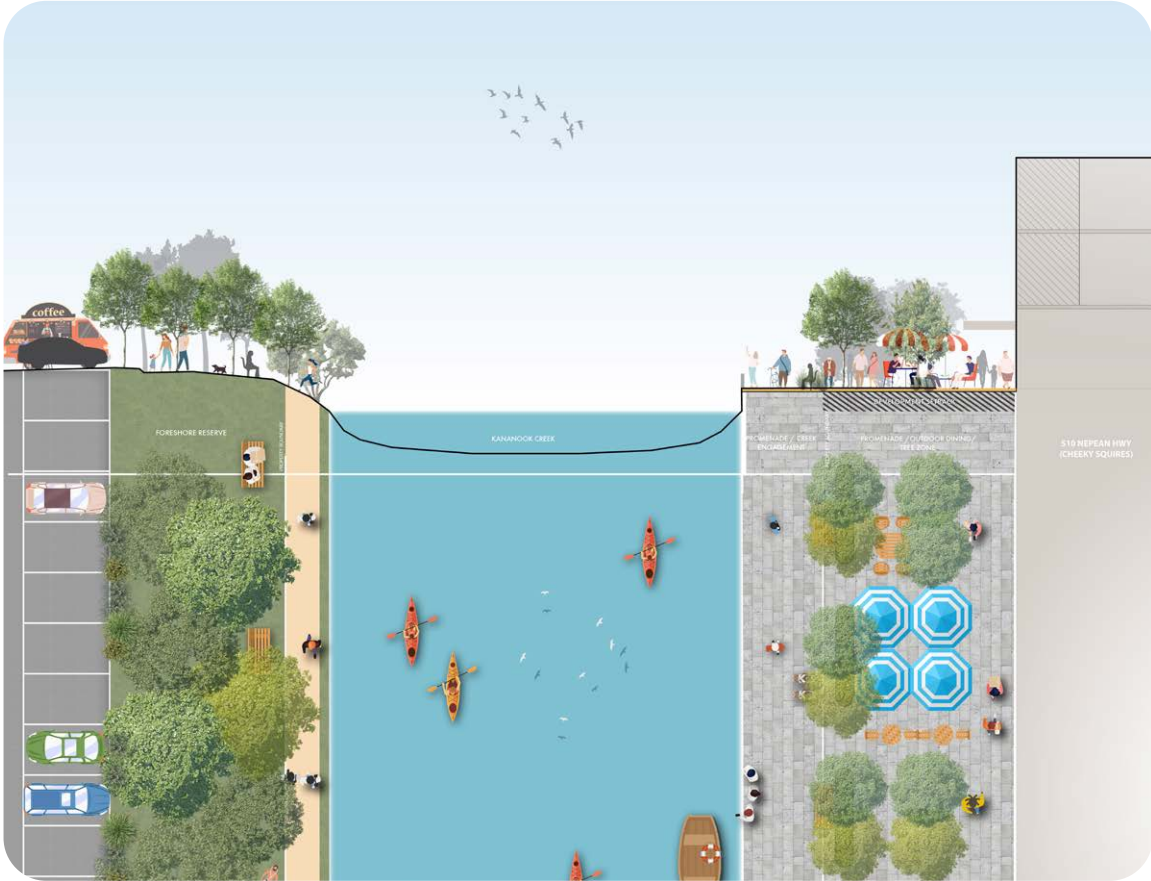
Example plans and cross sections showing how Kananook Creek could be enhanced
